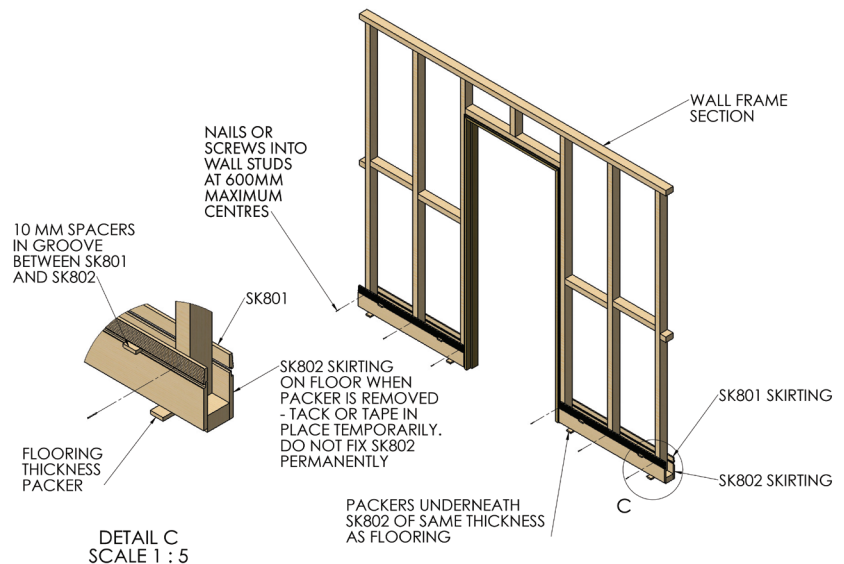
UPPER SKIRTING SECTION FIXING DETAILS
